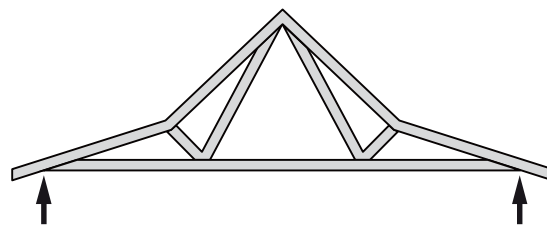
(in part) TYPICAL TRUSS SHAPES
